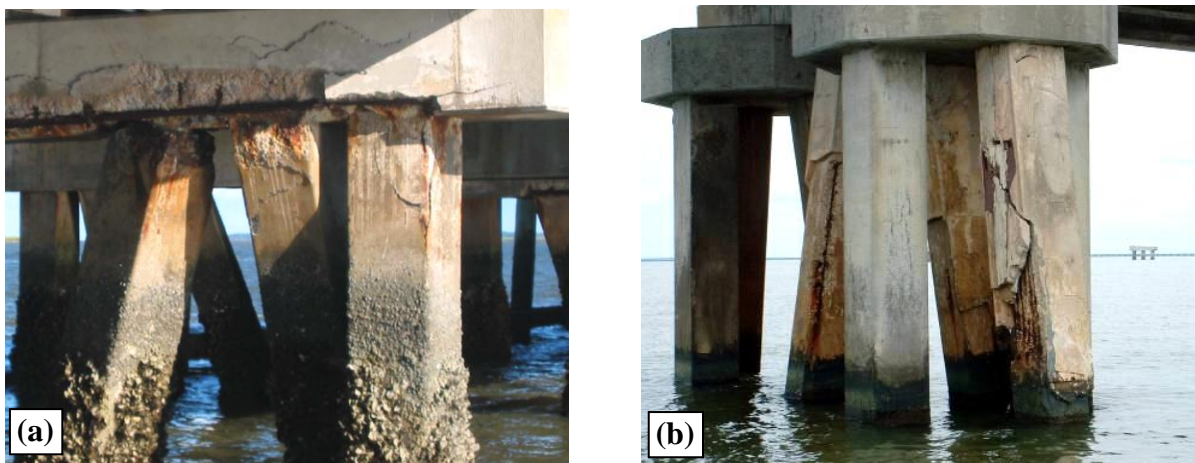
Corrosion of (a) concrete pile cap and (b) precast prestressed concrete piles (from Hamilton, 2007)
